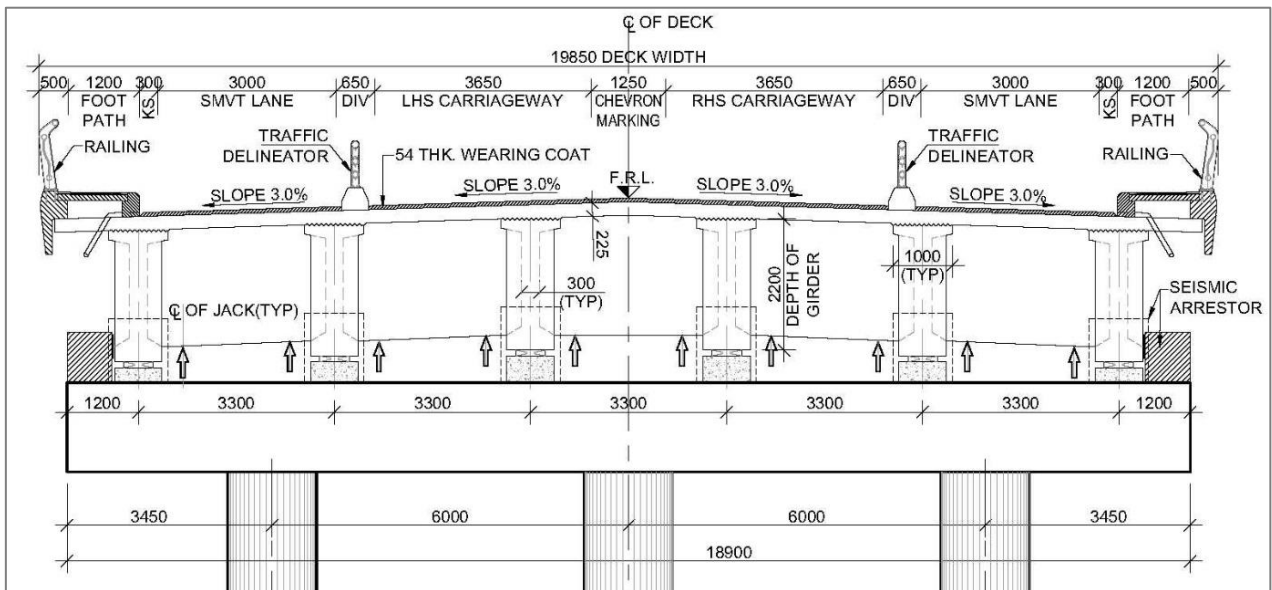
Cross Section of PSC I-Girder Type Viaduct
